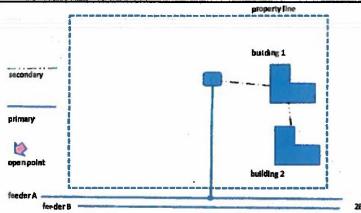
2 BUILDING CONNECTION less than 1,000kVA
